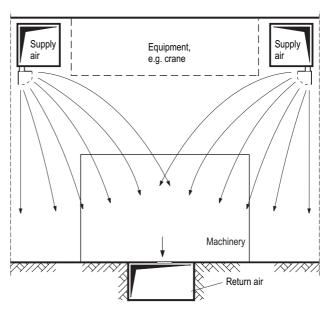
Air jet pattern of trapezoidal / semi-trapezoidal displacement outlet
